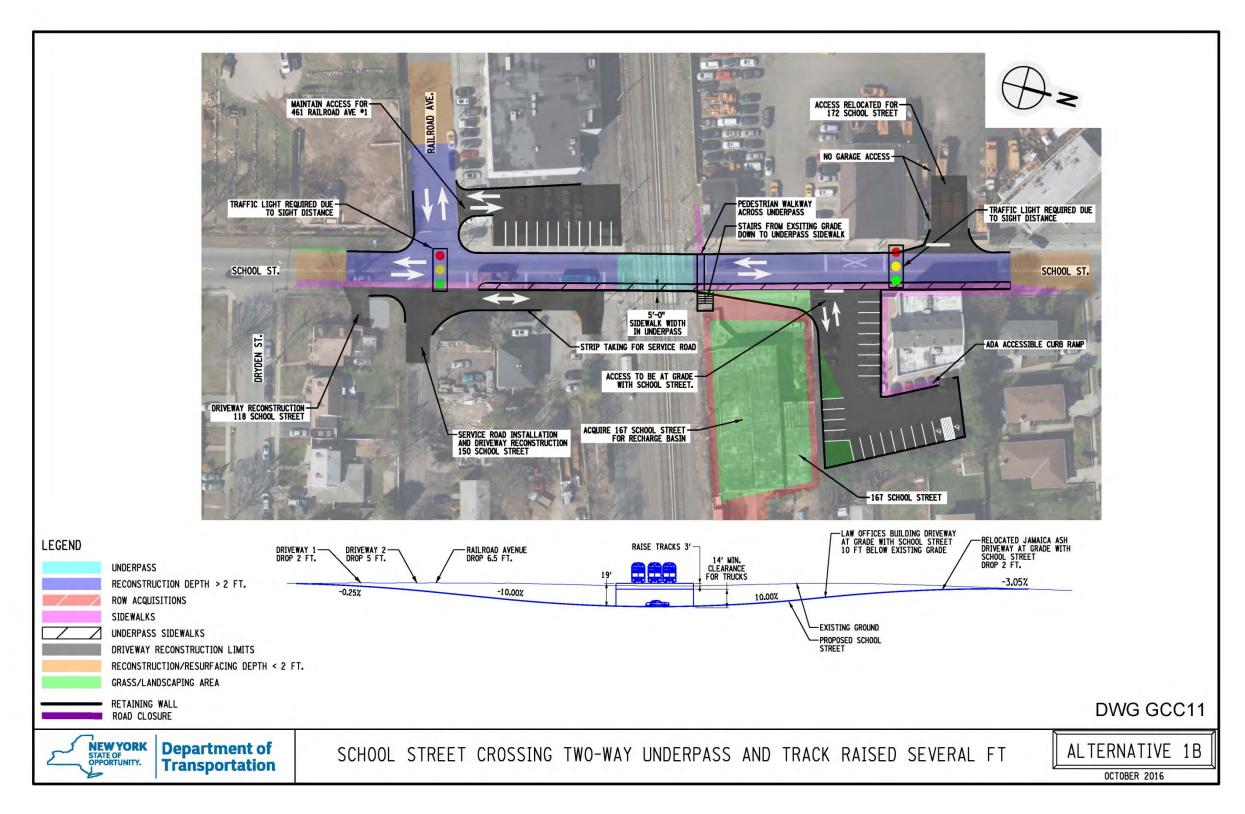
School Street Crossing (Alternative 1B: Two-Way Underpass and Track Raised Several Ft)
